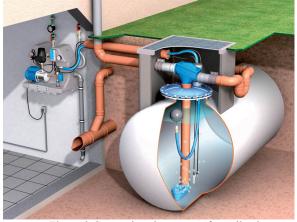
Comprehensive system for collecting rainwater to ensure the pump pressure in household and connection with sewer system
